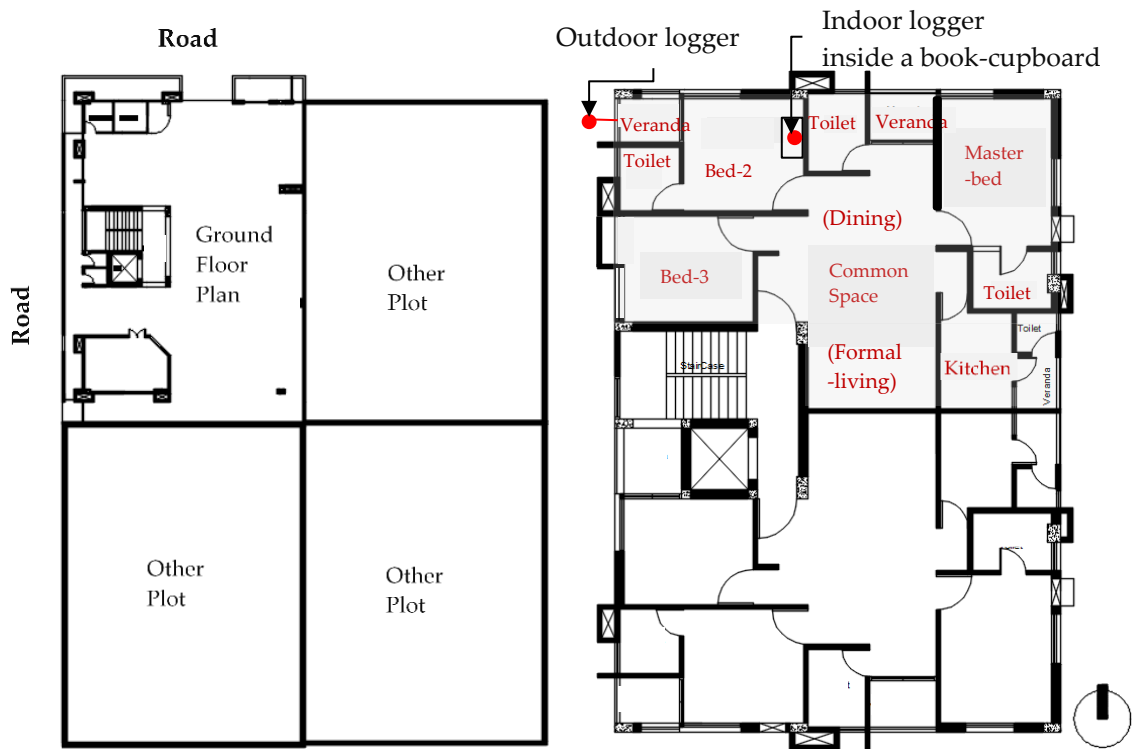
Ground Floor Plan and Unit-plan of the Case Study Apartment
